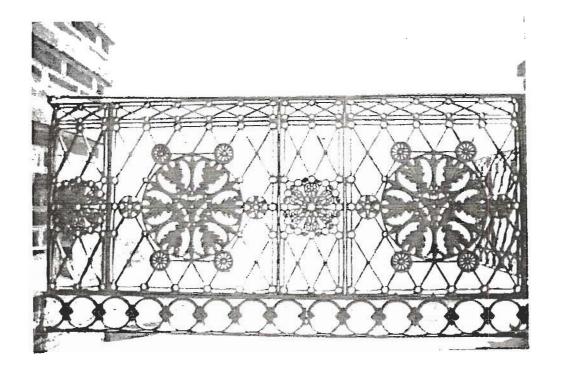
Cast Iron Filigree Railing Detail at Roof Vent Structure; West Face.
